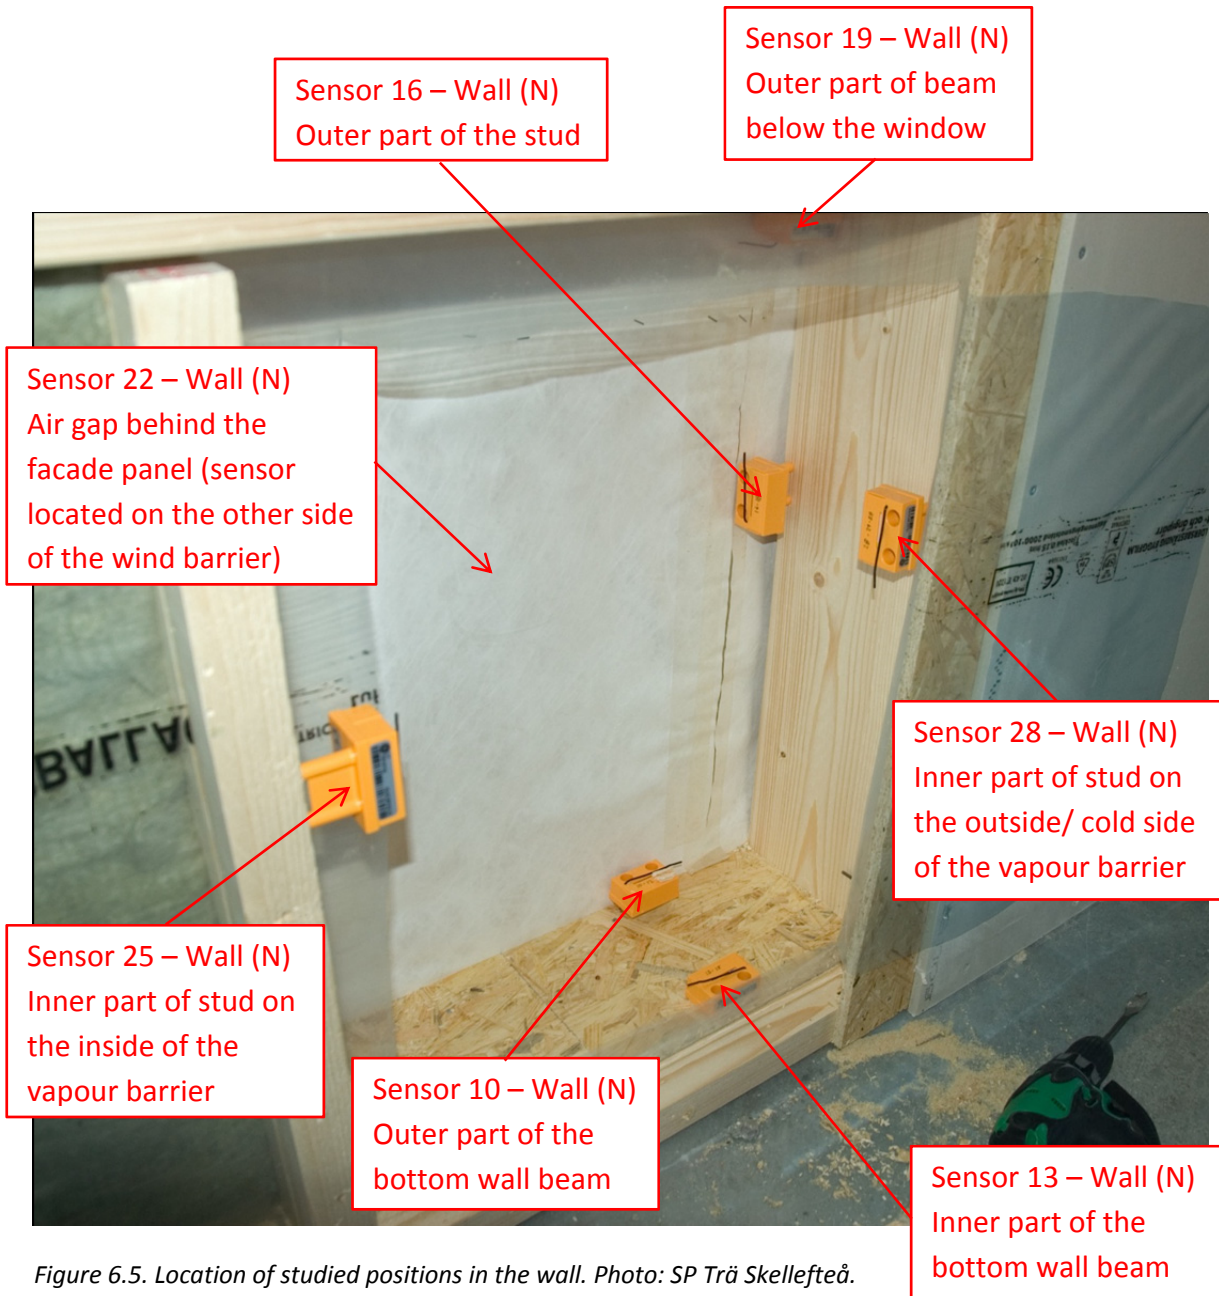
Location of studied positions in the wall. Photo: SP Trä Skellefteå.
